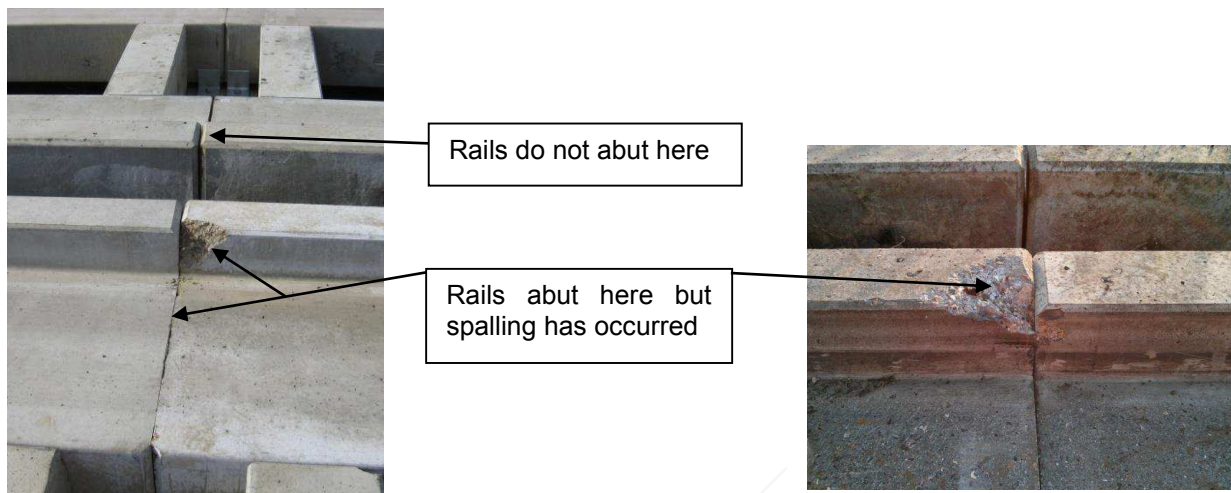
Photograph of guiderails not abutting, and spalling in locations where they do abut.
